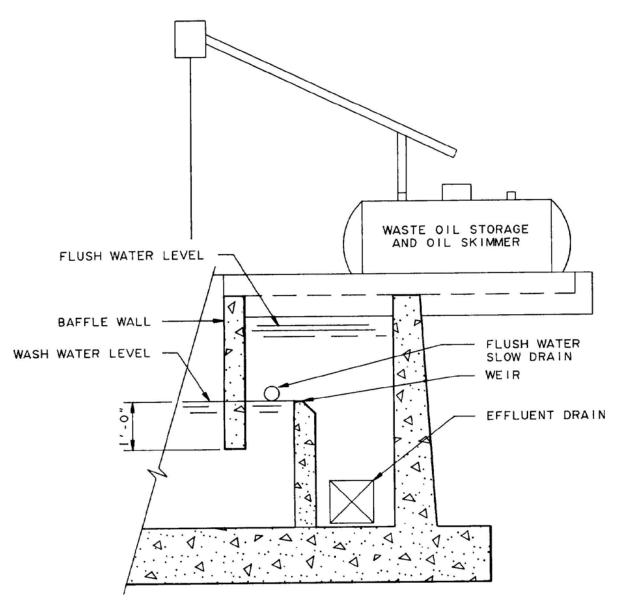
Example cross section of an outlet structure (UFC 4-214-03, 2004).
